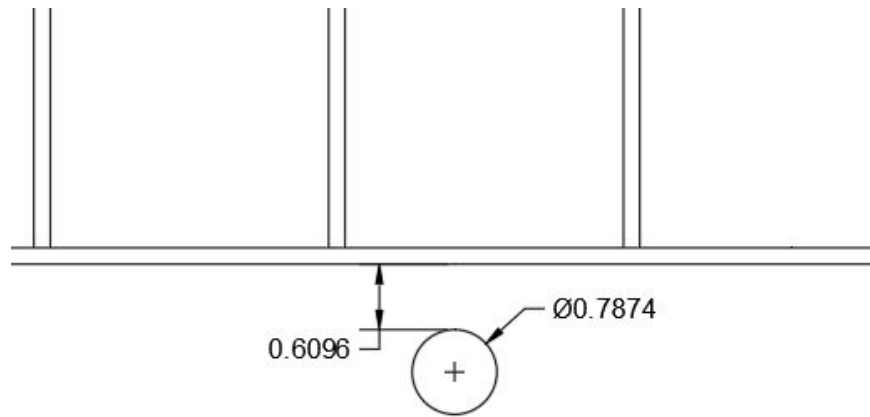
Up-close view of dimensioned AutoCAD drawing and placement of stormwater sewer drain in Covered Area #5.
